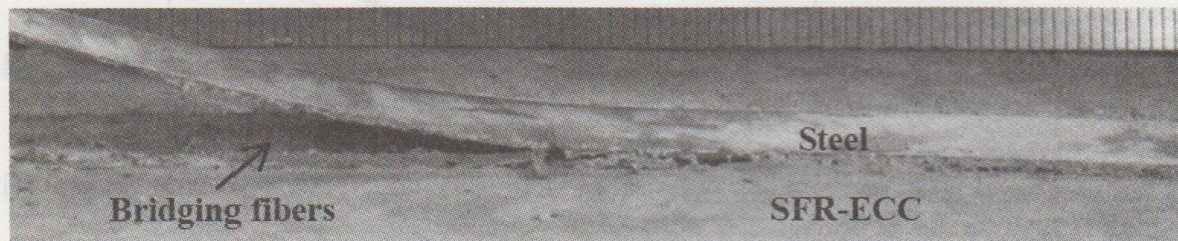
Fibers bridge across the delamination crack between steel and SFR-ECC.
